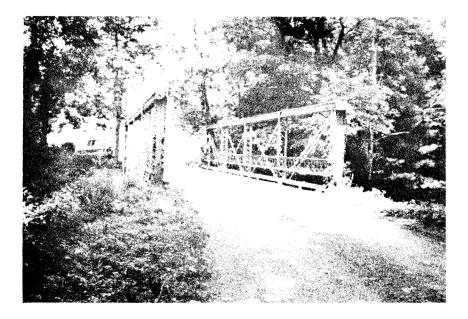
One of five bedstead/truss leg bridges built in the Staunton Construction District; dates unknown. (See form/photo number 08-07-13.)
